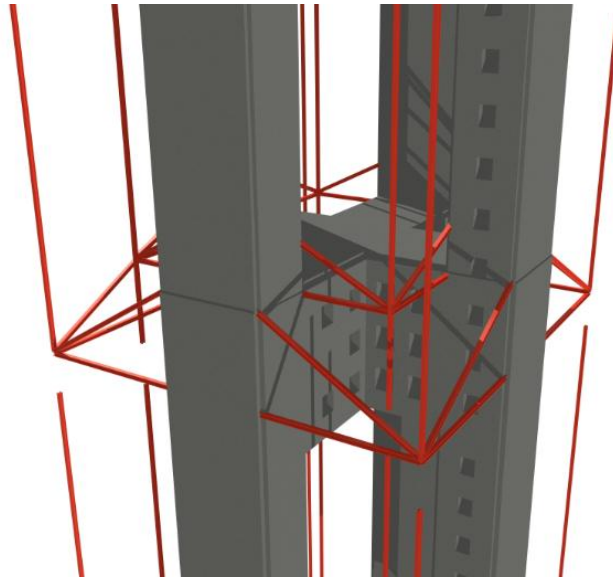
Floors around station, showing the framework connecting to mega columns via diagonals and the horizontal tubing connecting the legs (Tyréns)
